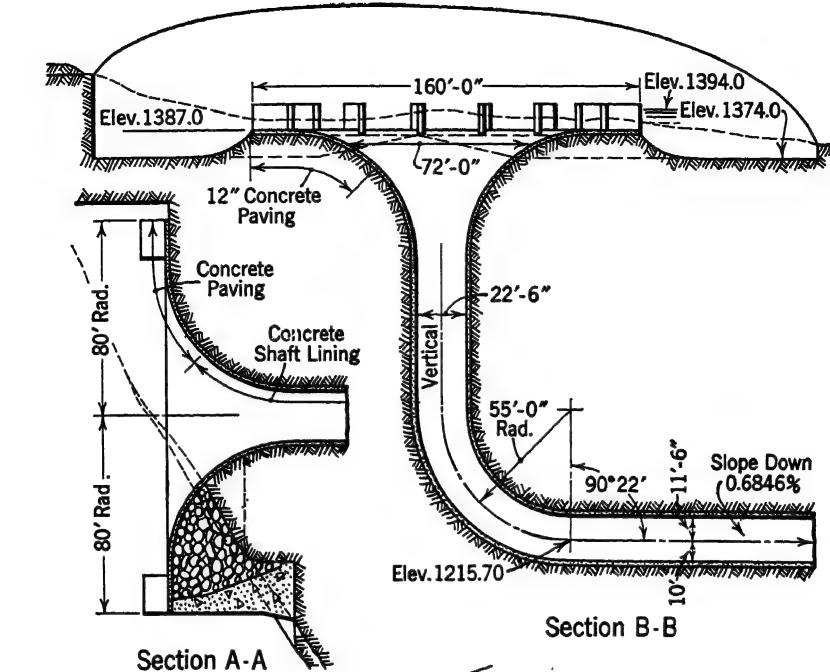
Davis Bridge Dam shaft spillway (*Eng. News-Record*, Jan. 24, 1924, p. 148).
